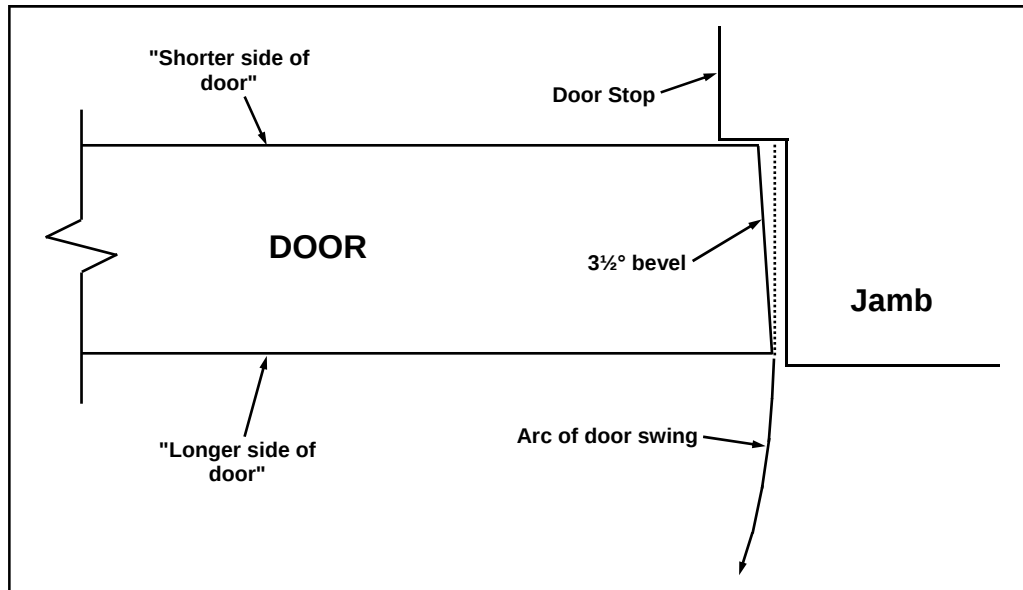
EXAMPLE OF BEVELED DOOR (TOP VIEW)
